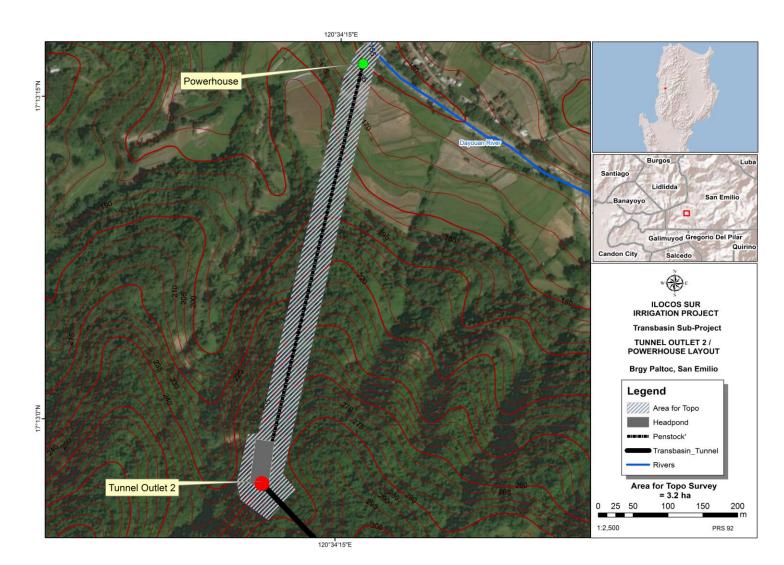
Proposed Tunnel Outlet 2 - Powerhouse Layout
